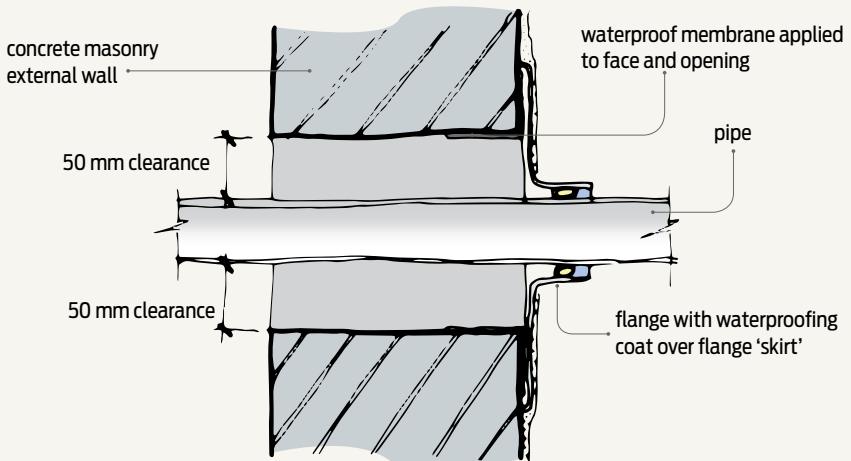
Penetration through concrete masonry external wall (NZS 4219:2009). Note that E2/AS3 (CCANZ CP01) does not require a 50 mm clearance.
